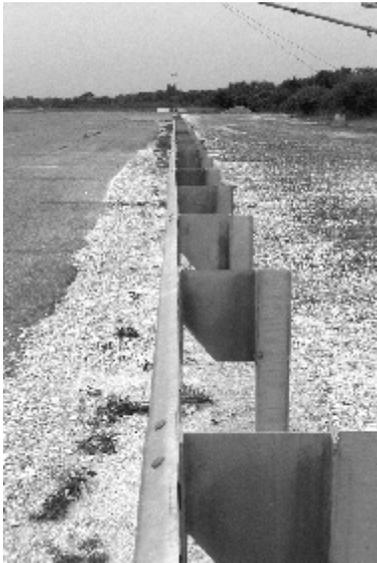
Modified Thrie Beam Guardrail installation before test 404211-5a.
